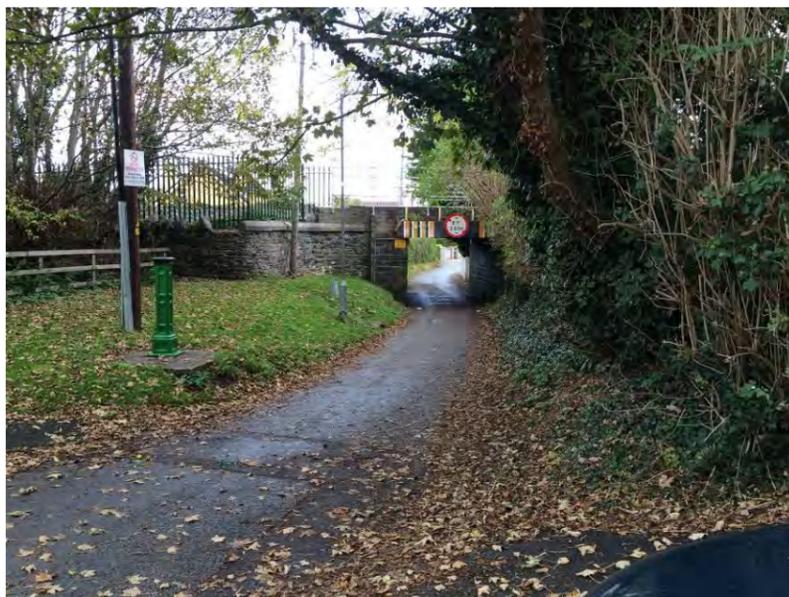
Trapped sag at Dublin-Belfast railway underpass
